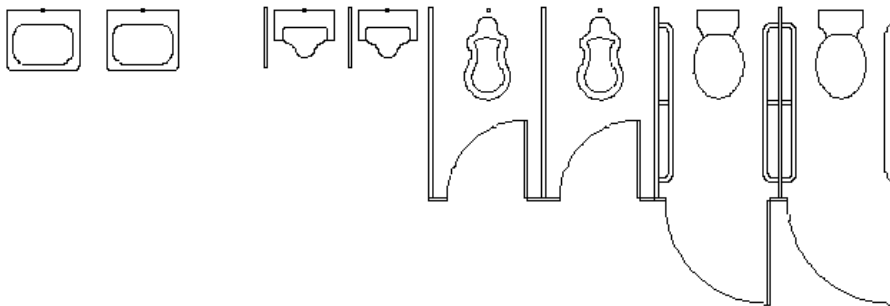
A line of fixtures drawn with the Plumbing macro.
